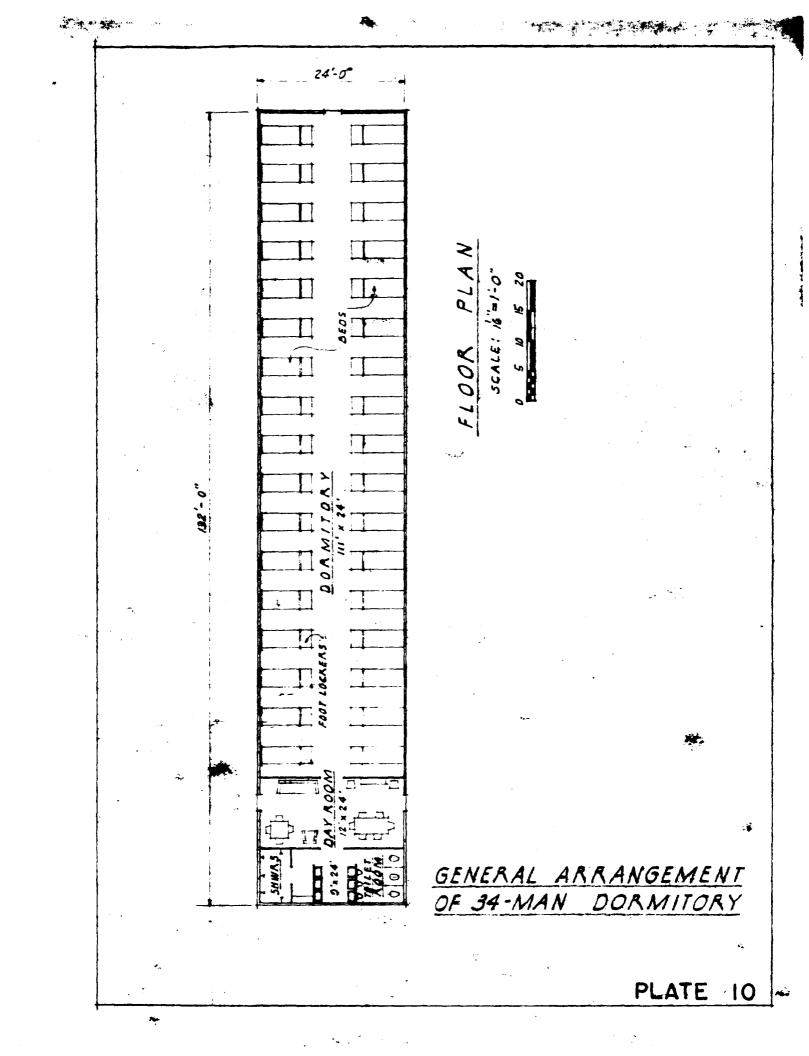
shows the general arrangement of buildings. The quarters for Scientists have been located east of the main road and consist of six buildings, housing eight men each in single rooms, and ten buildings housing sixteen men each in double rooms. The general appearance of the buildings is shown on Plate 7, and schematic floor plans for the Scientists' quarters are shown on Plate 9. Across the main road and north of the location for the Administration Building, are twelve dormitories housing thirty-four men each, with Day Room and toilet facilities at one end of the building. Schematic plan of this building is shown on Plate 10.
